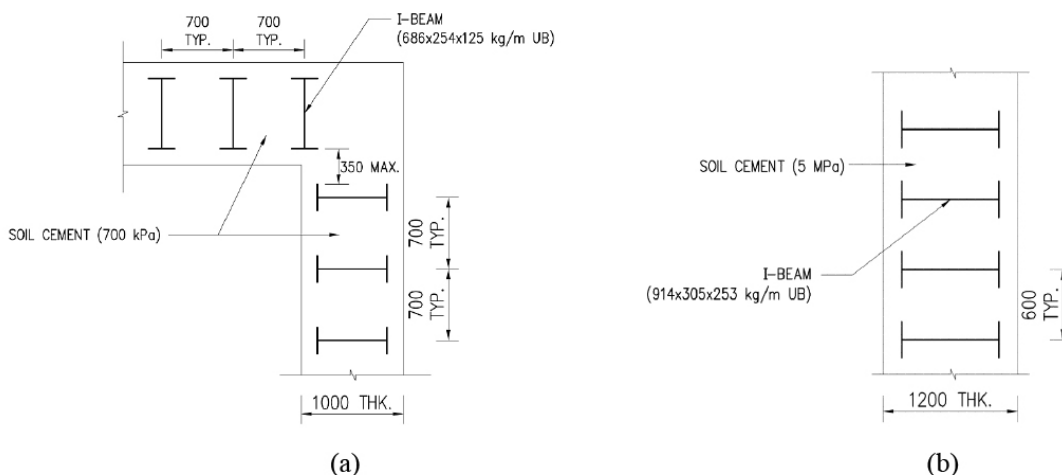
Layout of steel beam walls for (a) Site A and (b) Site B
